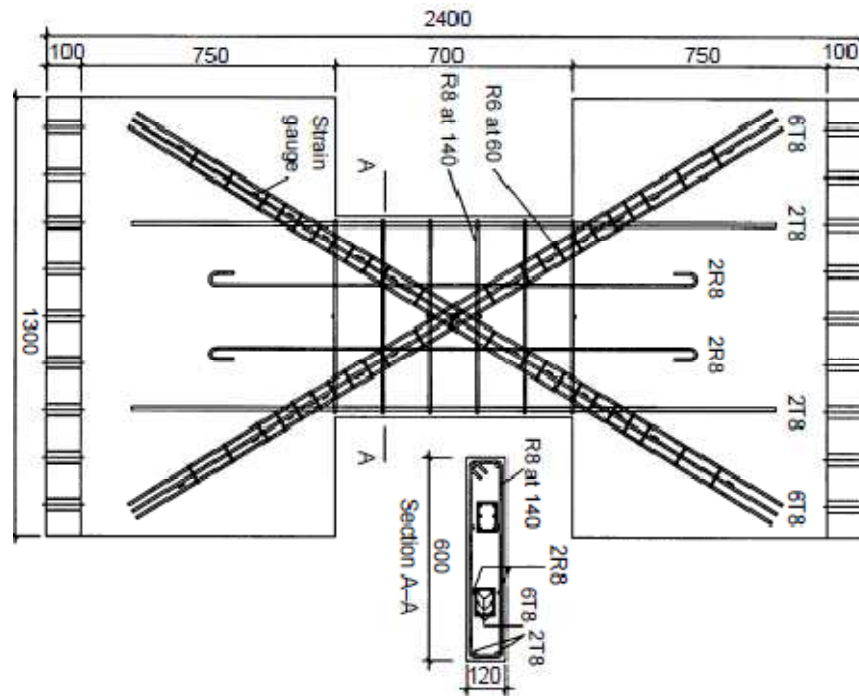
Typical Layout of Diagonally Reinforced Coupling Beam (Kwan and Zhao 2002)
